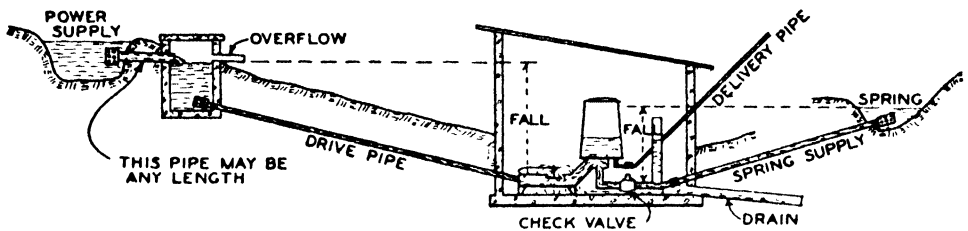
A double-acting hydraulic ram installation. Water from the source on the left is used for power to pump spring water from the right. The spring supply pipe should have a stand pipe as shown and must have a check valve.
